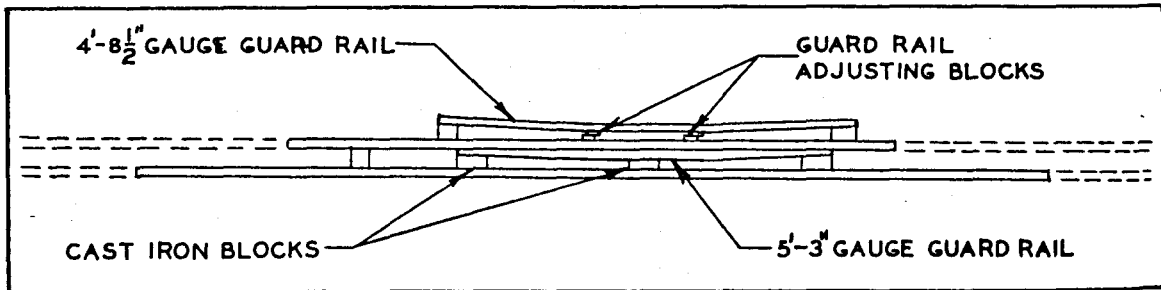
THE SPECIAL DOUBLE GUARD RAIL ASSEMBLY
